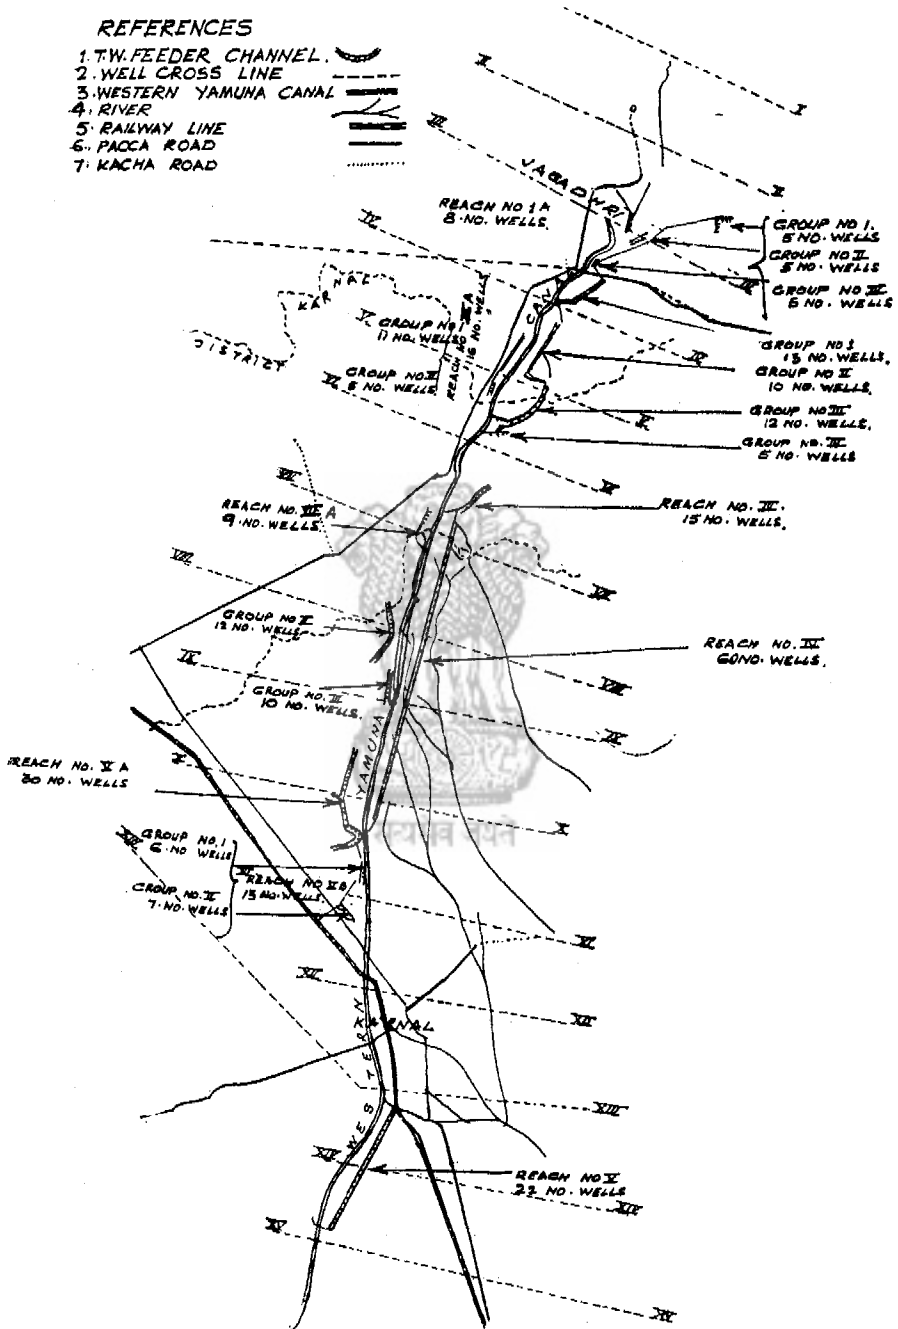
Index plan showing Tubewell Feeder Channel in Jagadhri Tubewell Project
